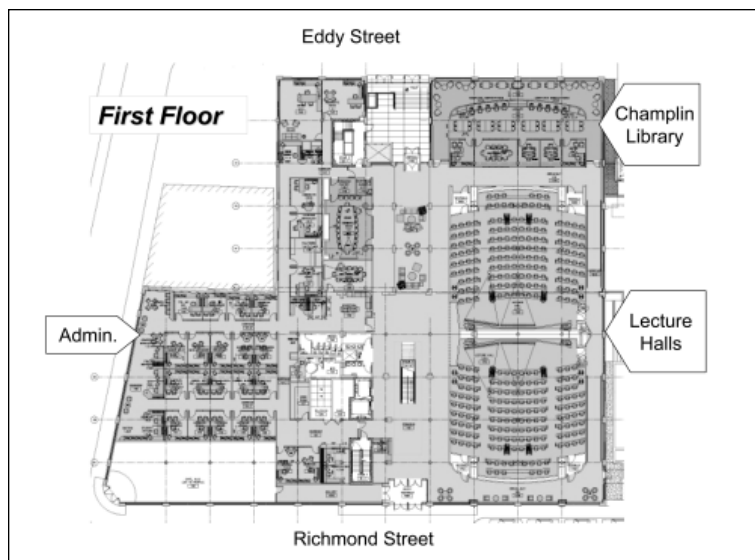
The floor plan for the first floor of the new facility. Note that a central atrium connects the Richmond Street and Eddy Street entrances.
